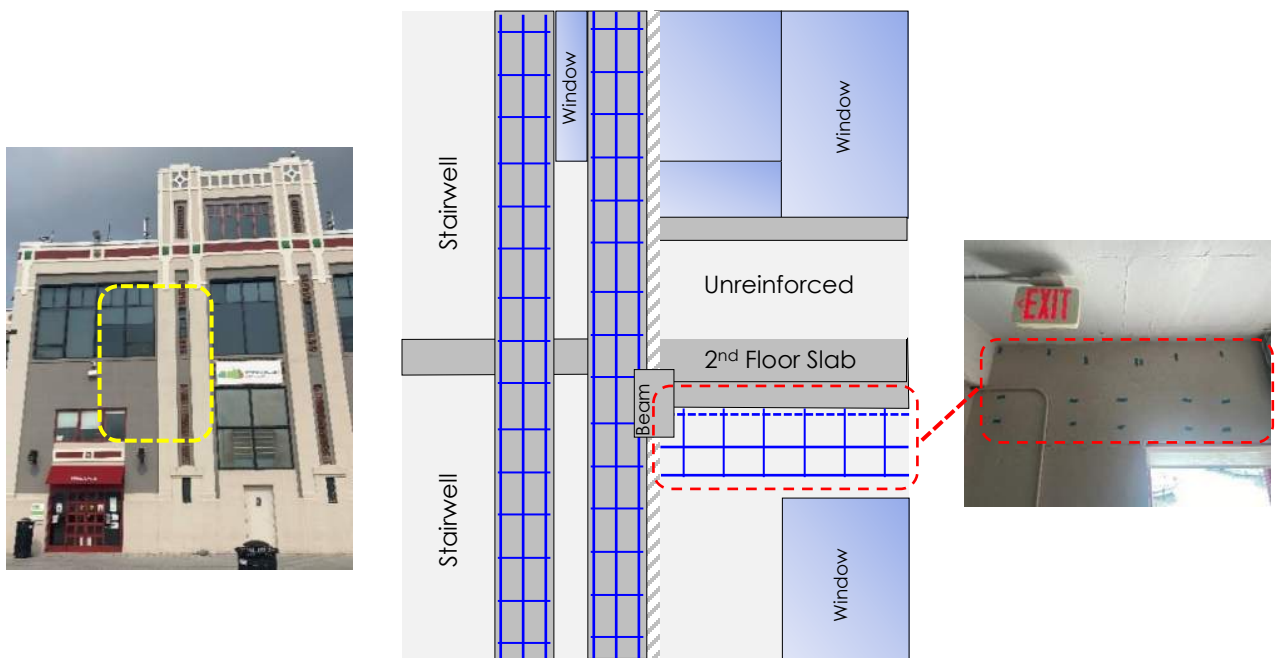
Spandrel / Wall Configuration (2nd Floor, Area 6)
